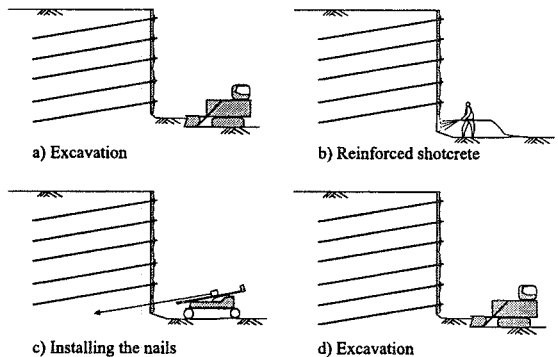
Construction sequence for a reinforced wall using soil nailing
